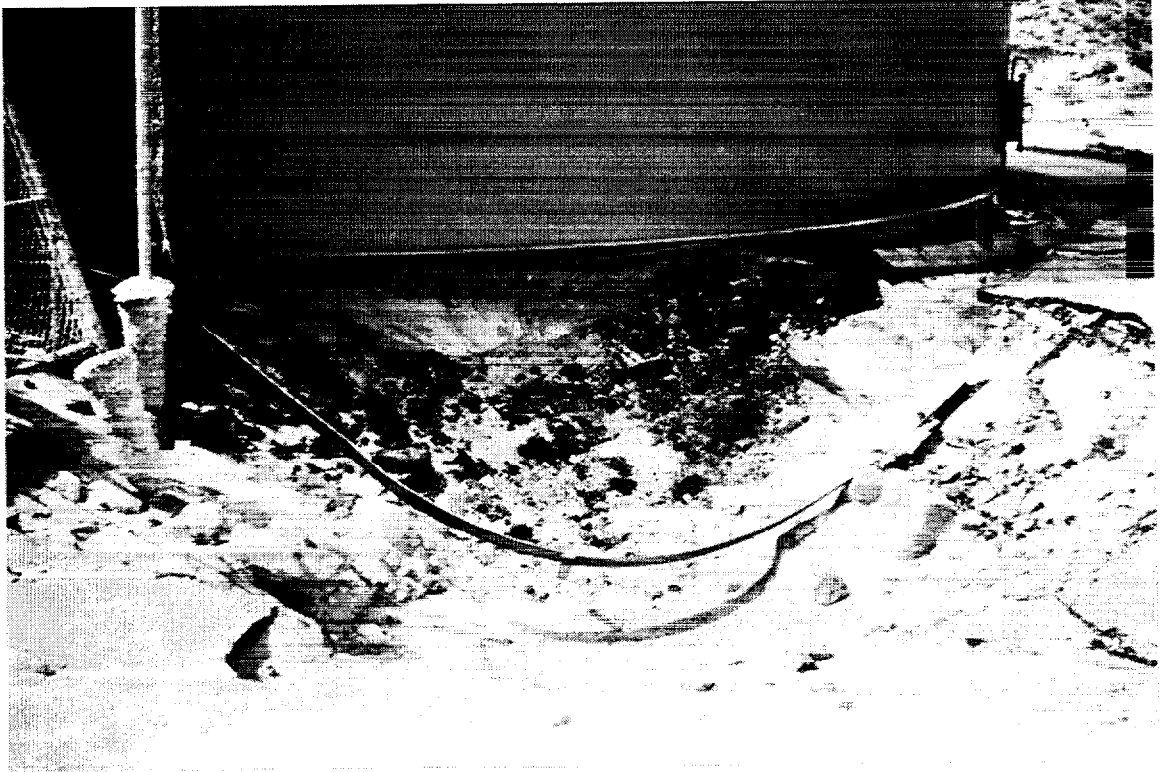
Olive View Hospital Tank which had a shell/floor failure [Steinbrugge Collection at UCB EERC Richmond]
